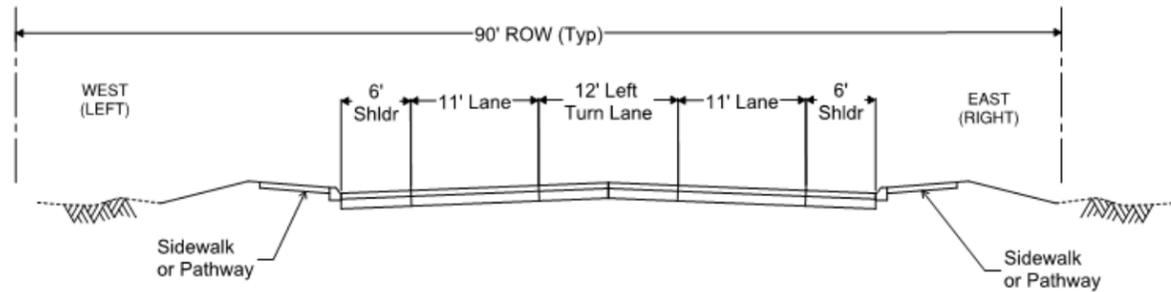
Typical Section with Adjacent Sidewalk or Pathway, Both Sides
